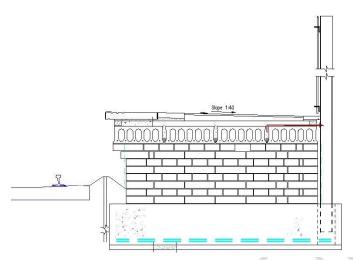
Cross-section of Network Rail standard design for a Type 2 Cross-wall platform
